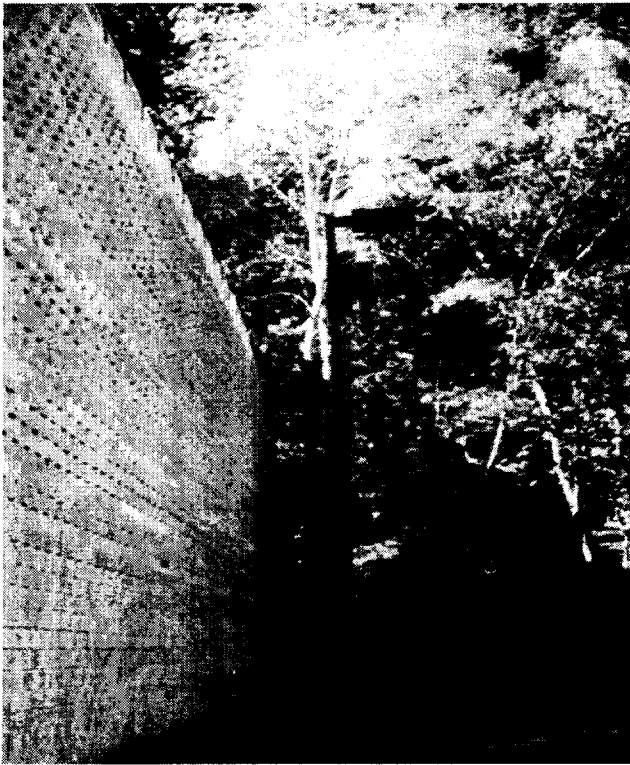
Example 12 m high geosynthetic reinforced segmental retaining wall (Anderson et al. 1991)
